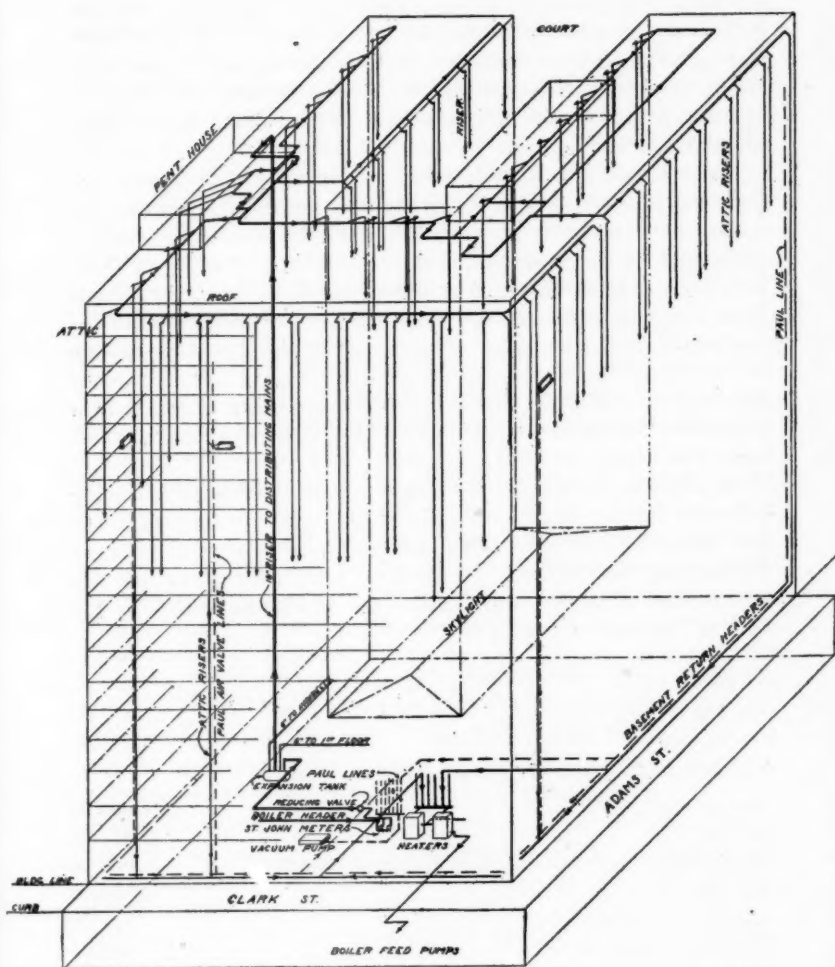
DIAGRAM OF BUILDING SHOWING ARRANGEMENT OF HEATING EQUIPMENT.
